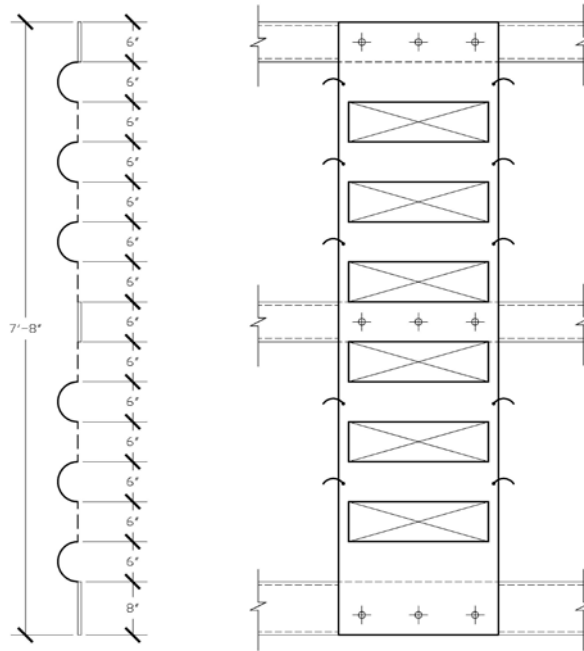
FRONT VIEW AND CROSS SECTION OF THE FIBERGLASS MID-TANK Baffle PANEL
